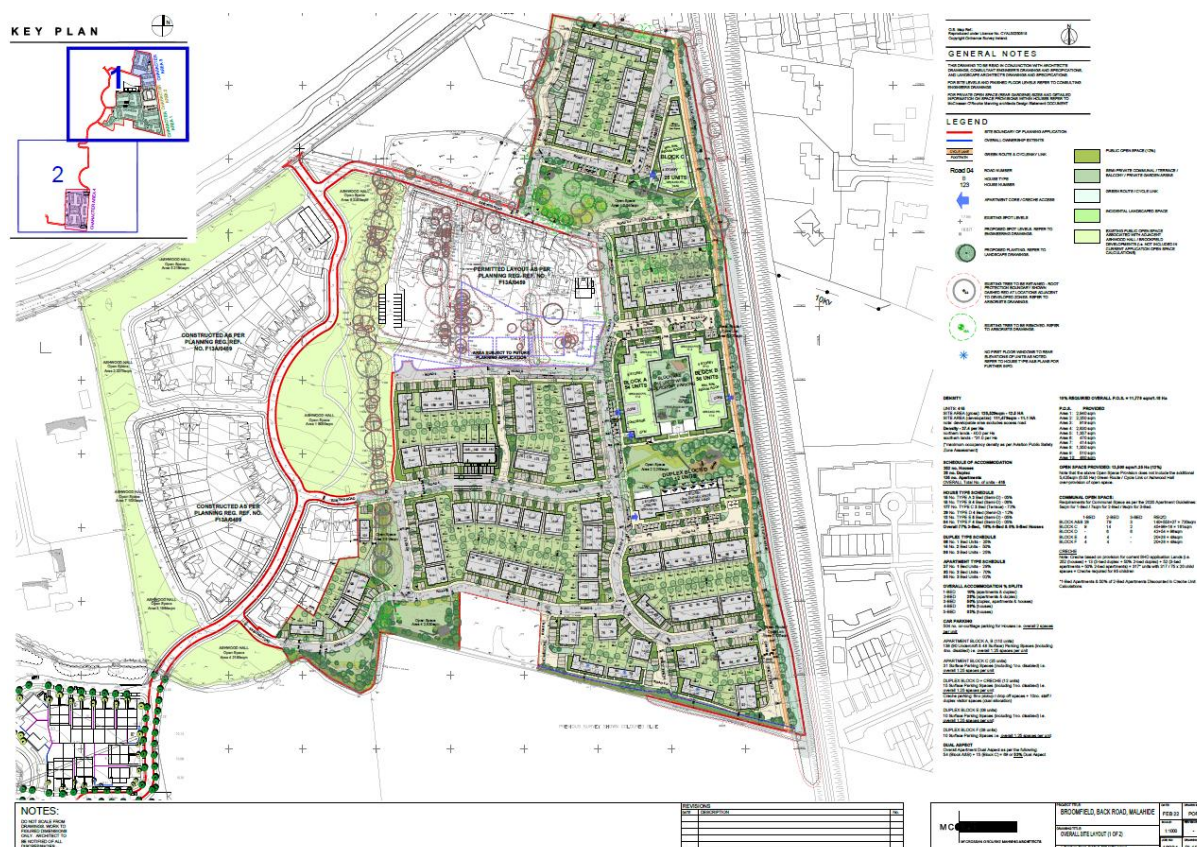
Refused Layout for Northern Portion of the Lands at Back Road, Broomfield under ABP-313361-22
